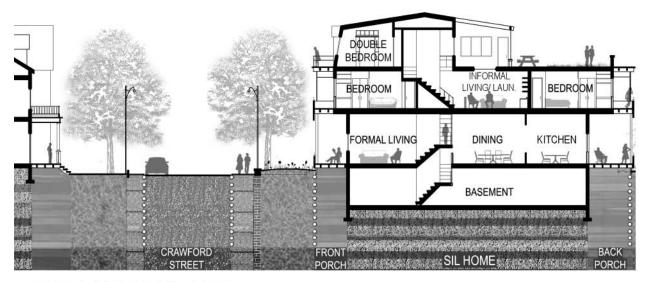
DETAIL SECTION B - 1:300 (Figure 3.2-21)
